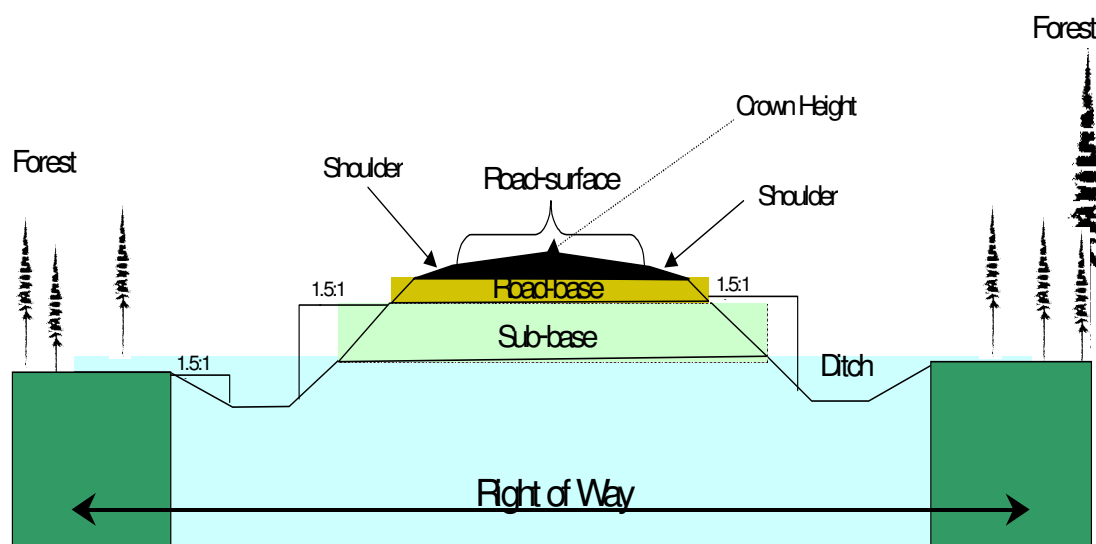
Typical road cross-section (Adapted from: FERIC, 1999).
